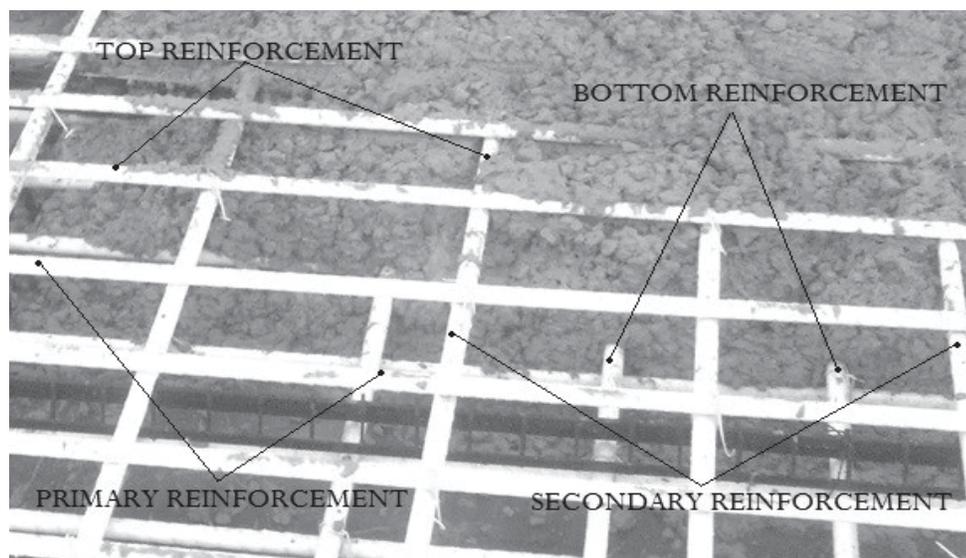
I 635 bridge deck over State Ave. in Kansas City, Kansas.
